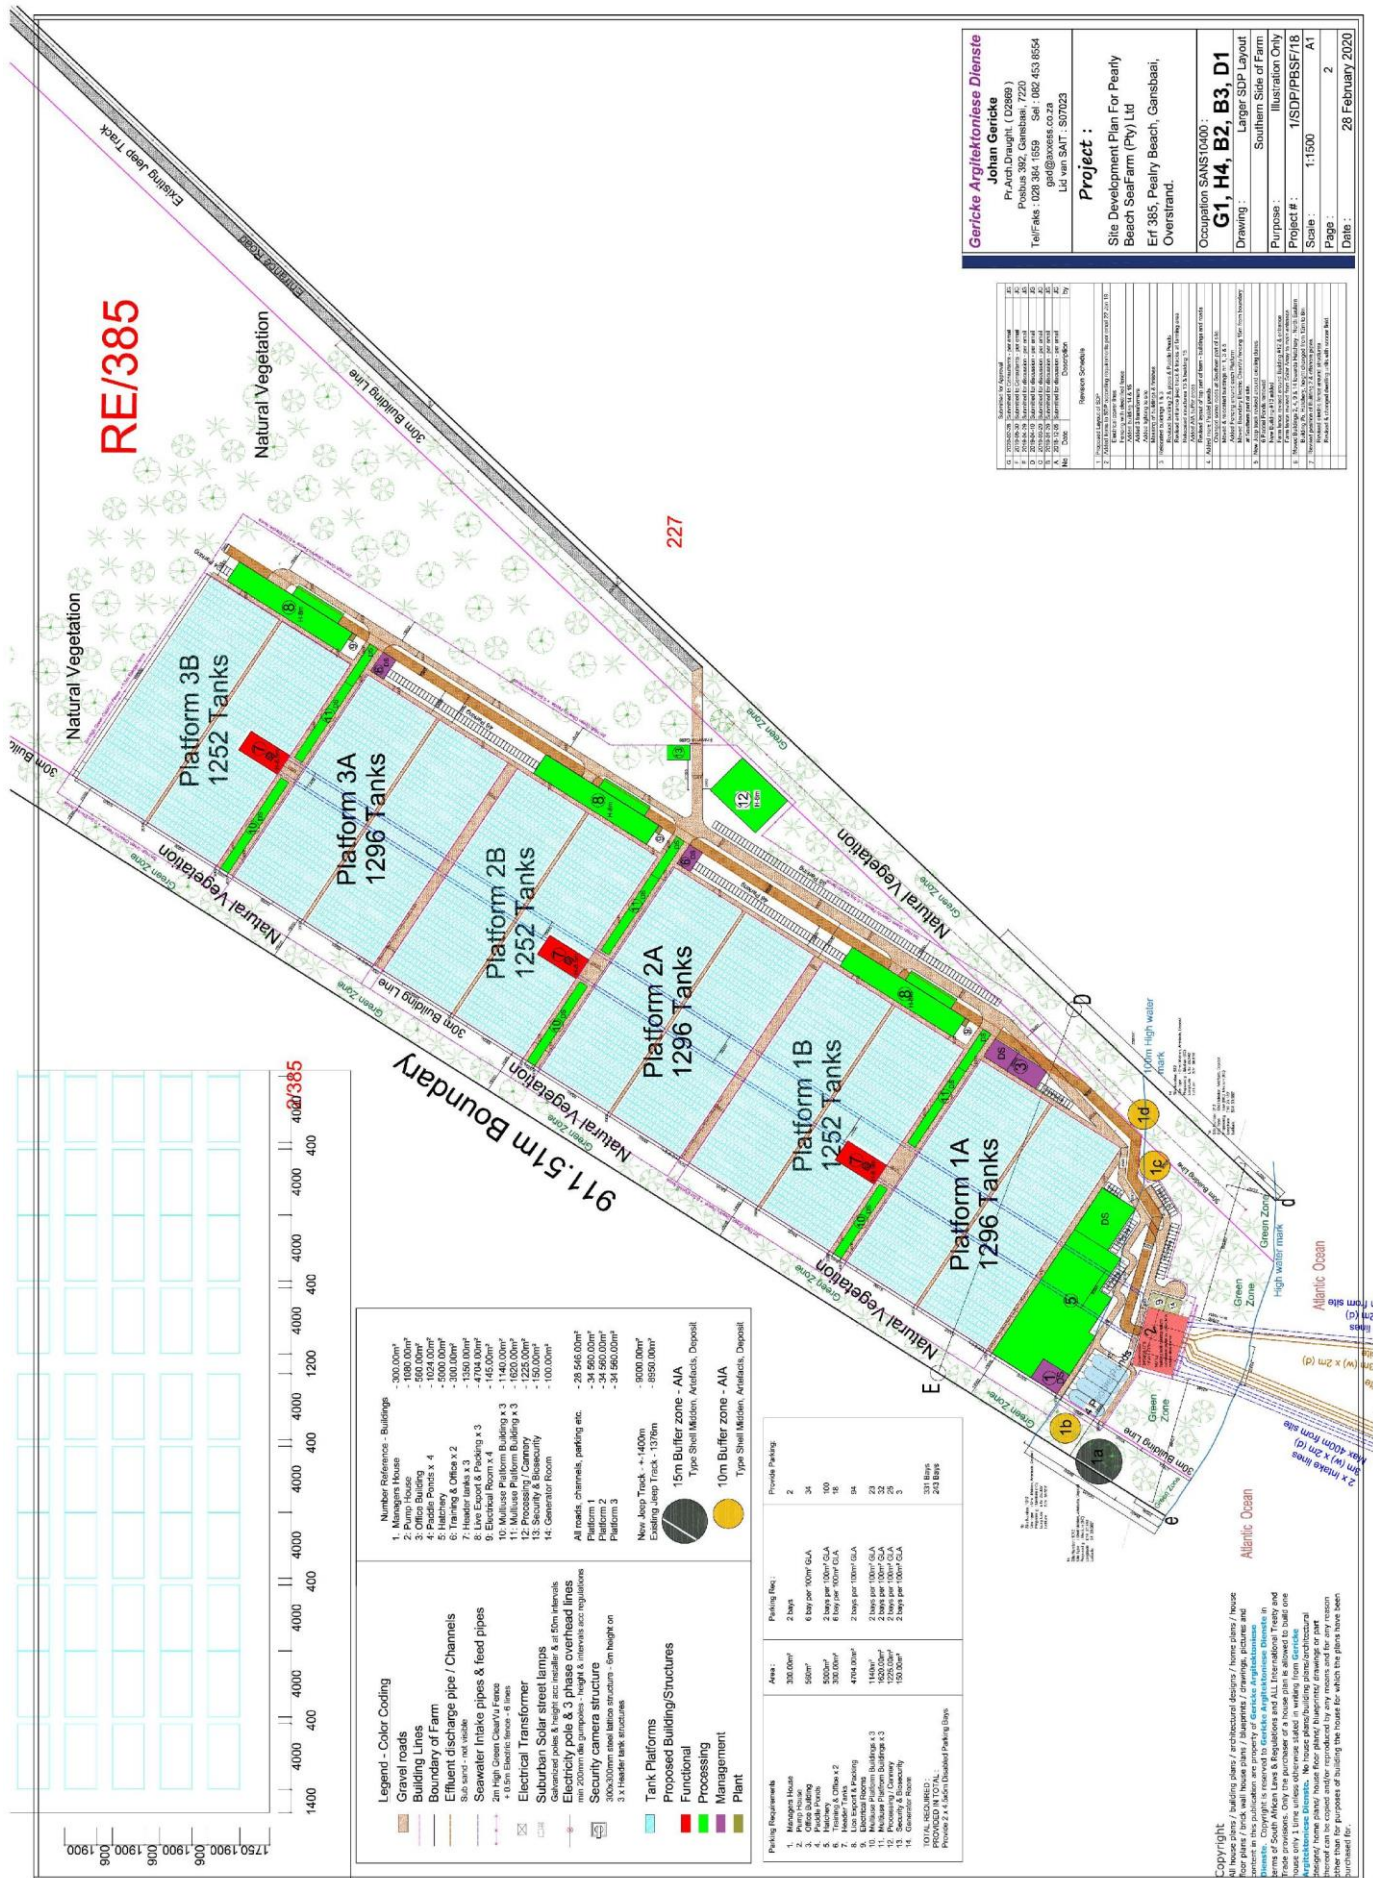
Site Development Plan of the southern development node on a Portion of Remainder of Farm No. 385, Pearly Beach
